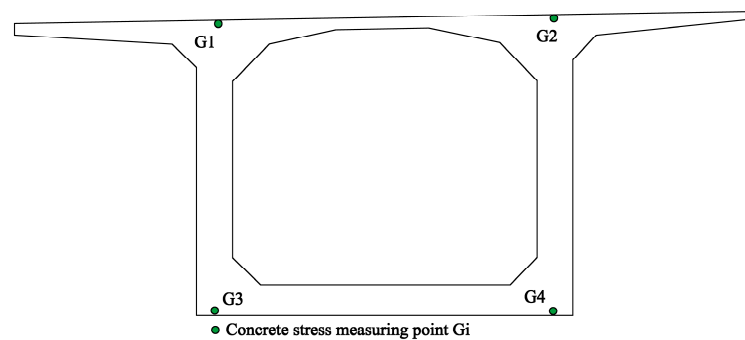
Stress measuring points of concrete sections 11-11 and 12-12.
